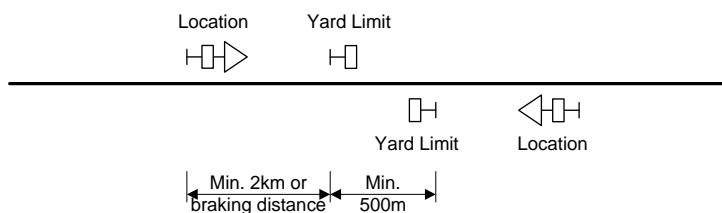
BLOCK LOCATION – No Crossing Loop or Siding Provided
